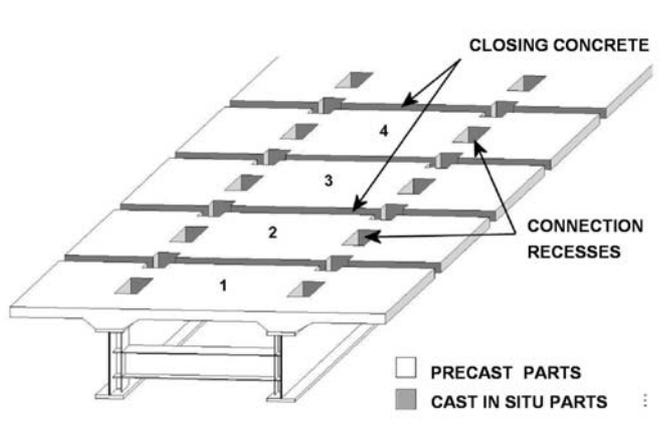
Precasting/In-situ casting distribution for a twin girder cross-beam deck
